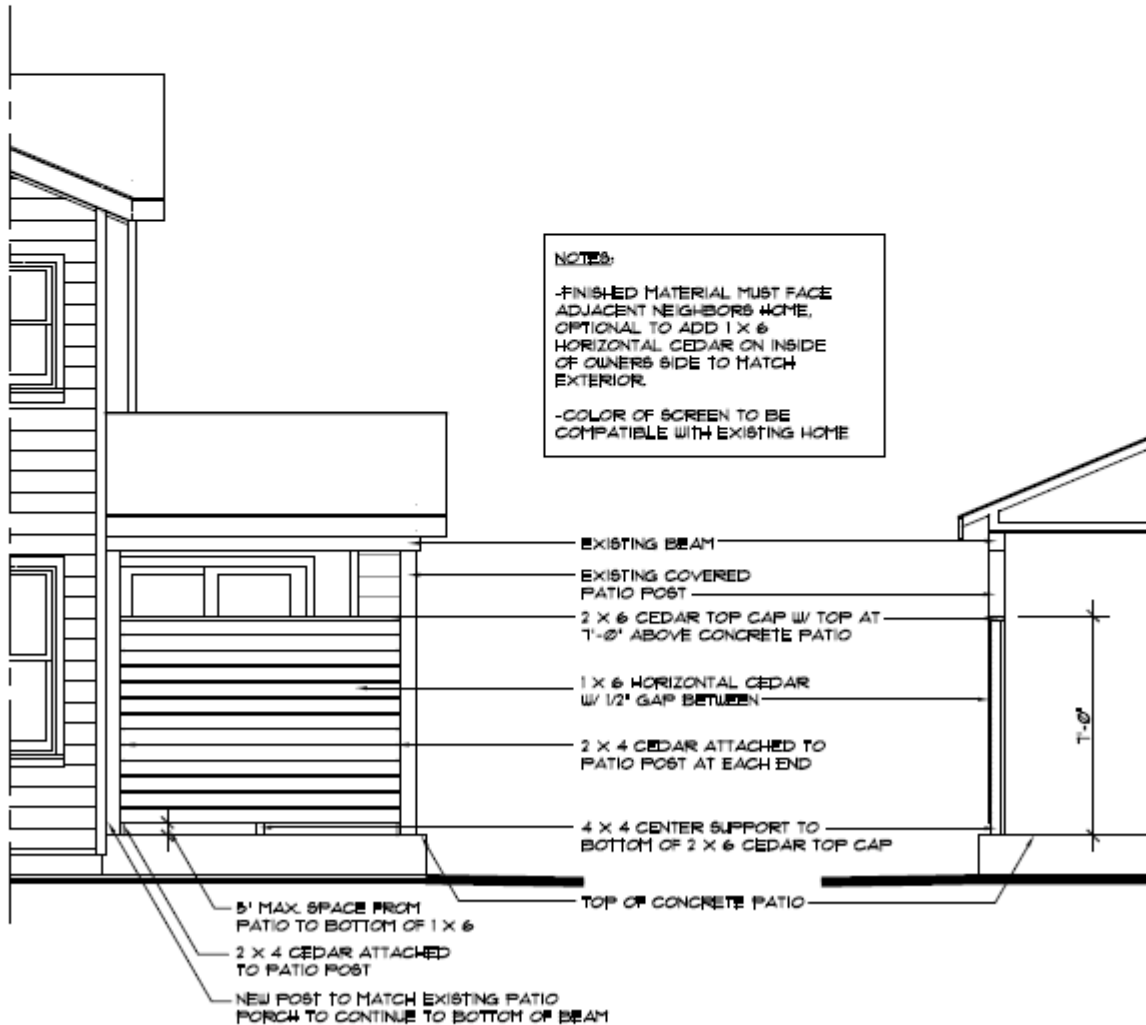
Trash Enclosure Detail (cont.)
